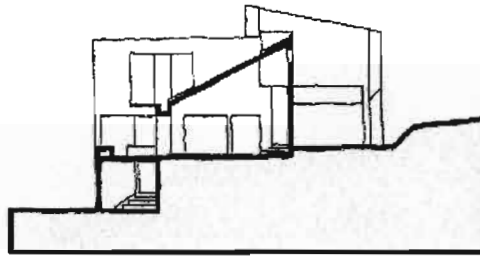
P.Mikula – House J.N. Reddy (1968). Section.
